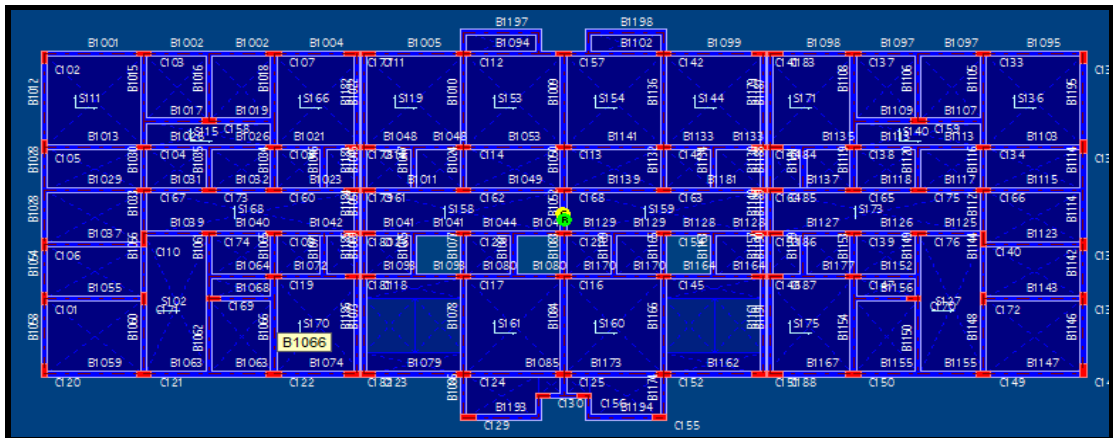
Plan of Two Stories with Flat Slab-Beam System
